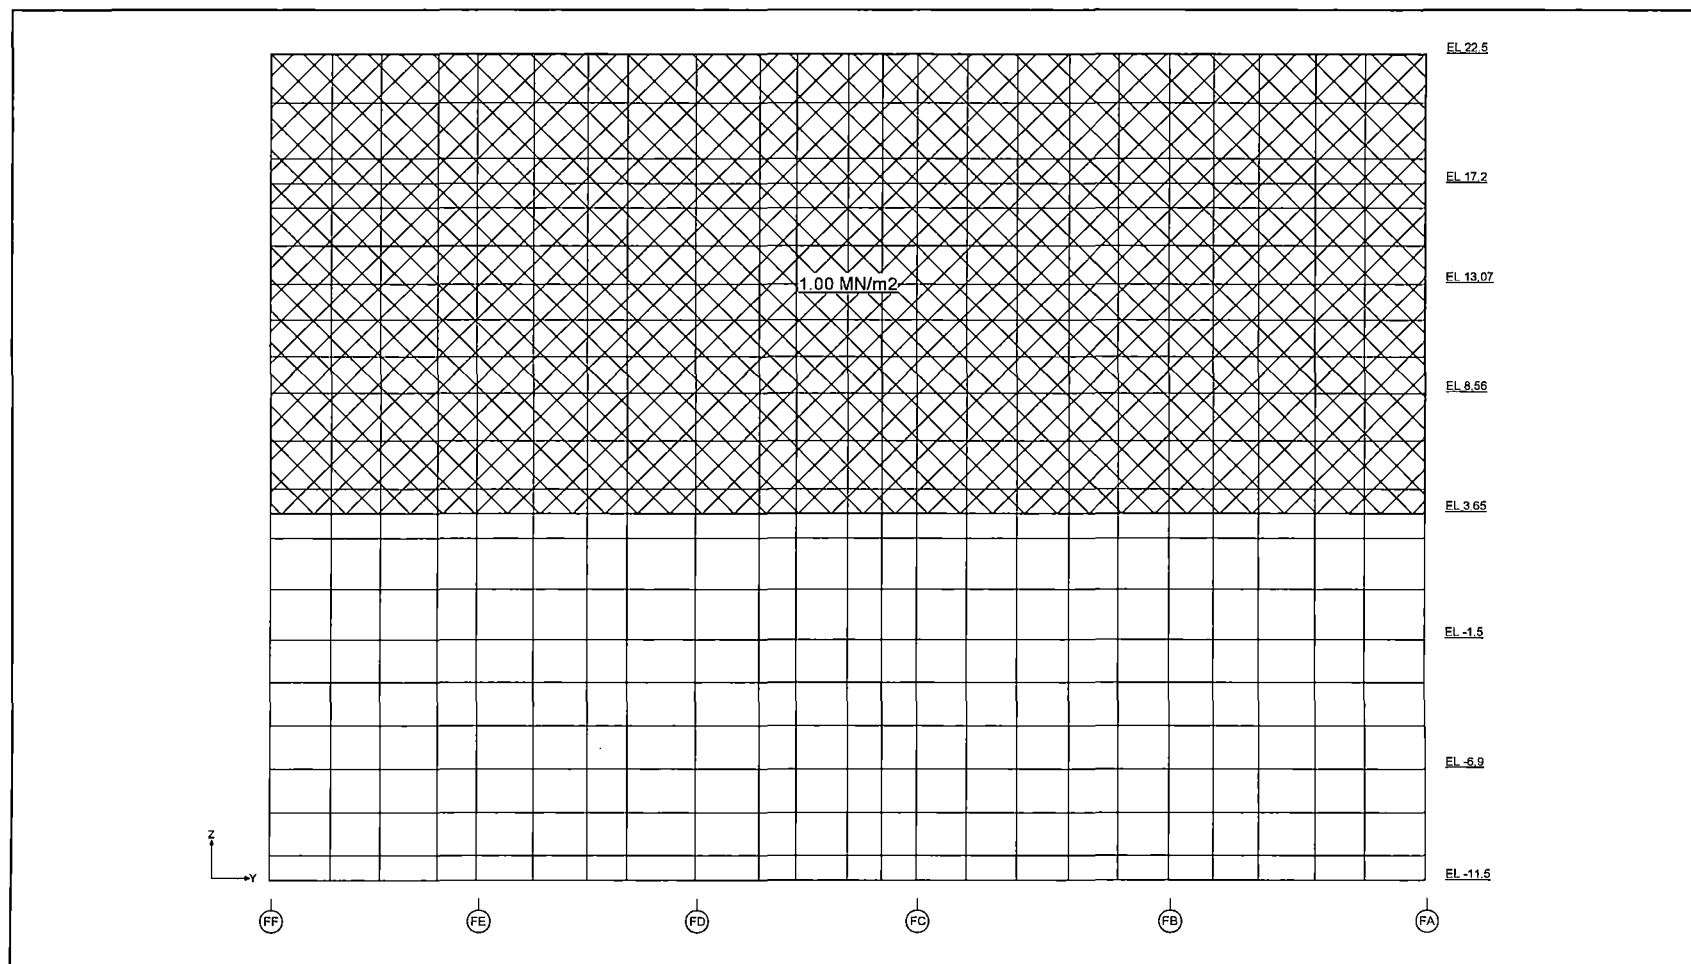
HELB Pressure Load (for FB General Rooms: F3 Wall)
